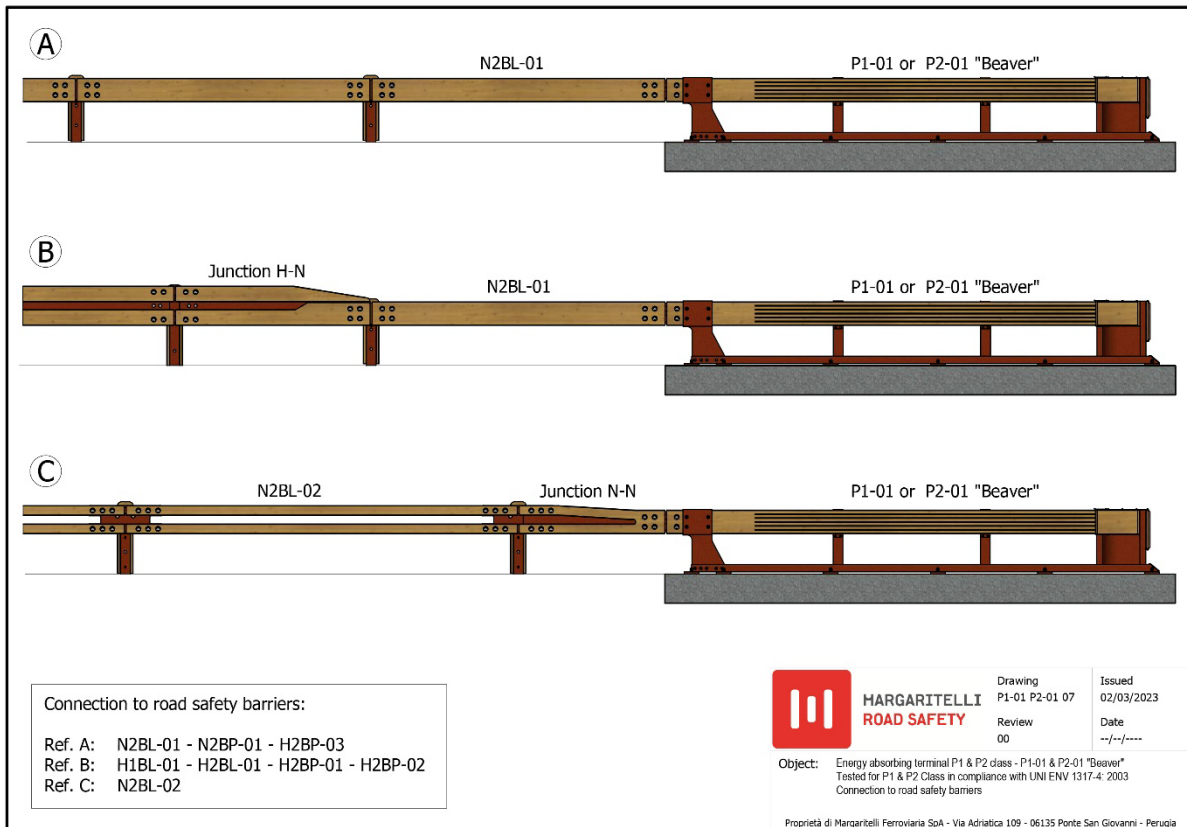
Connection with P1-01 and P2-01 Beaver terminals
